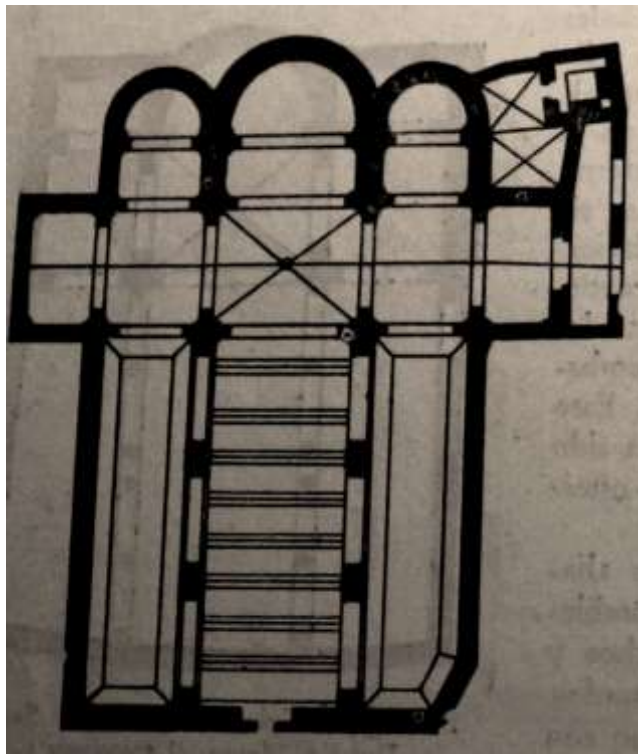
Ground floor plan of the Santiago del Arabal, Toledo.
